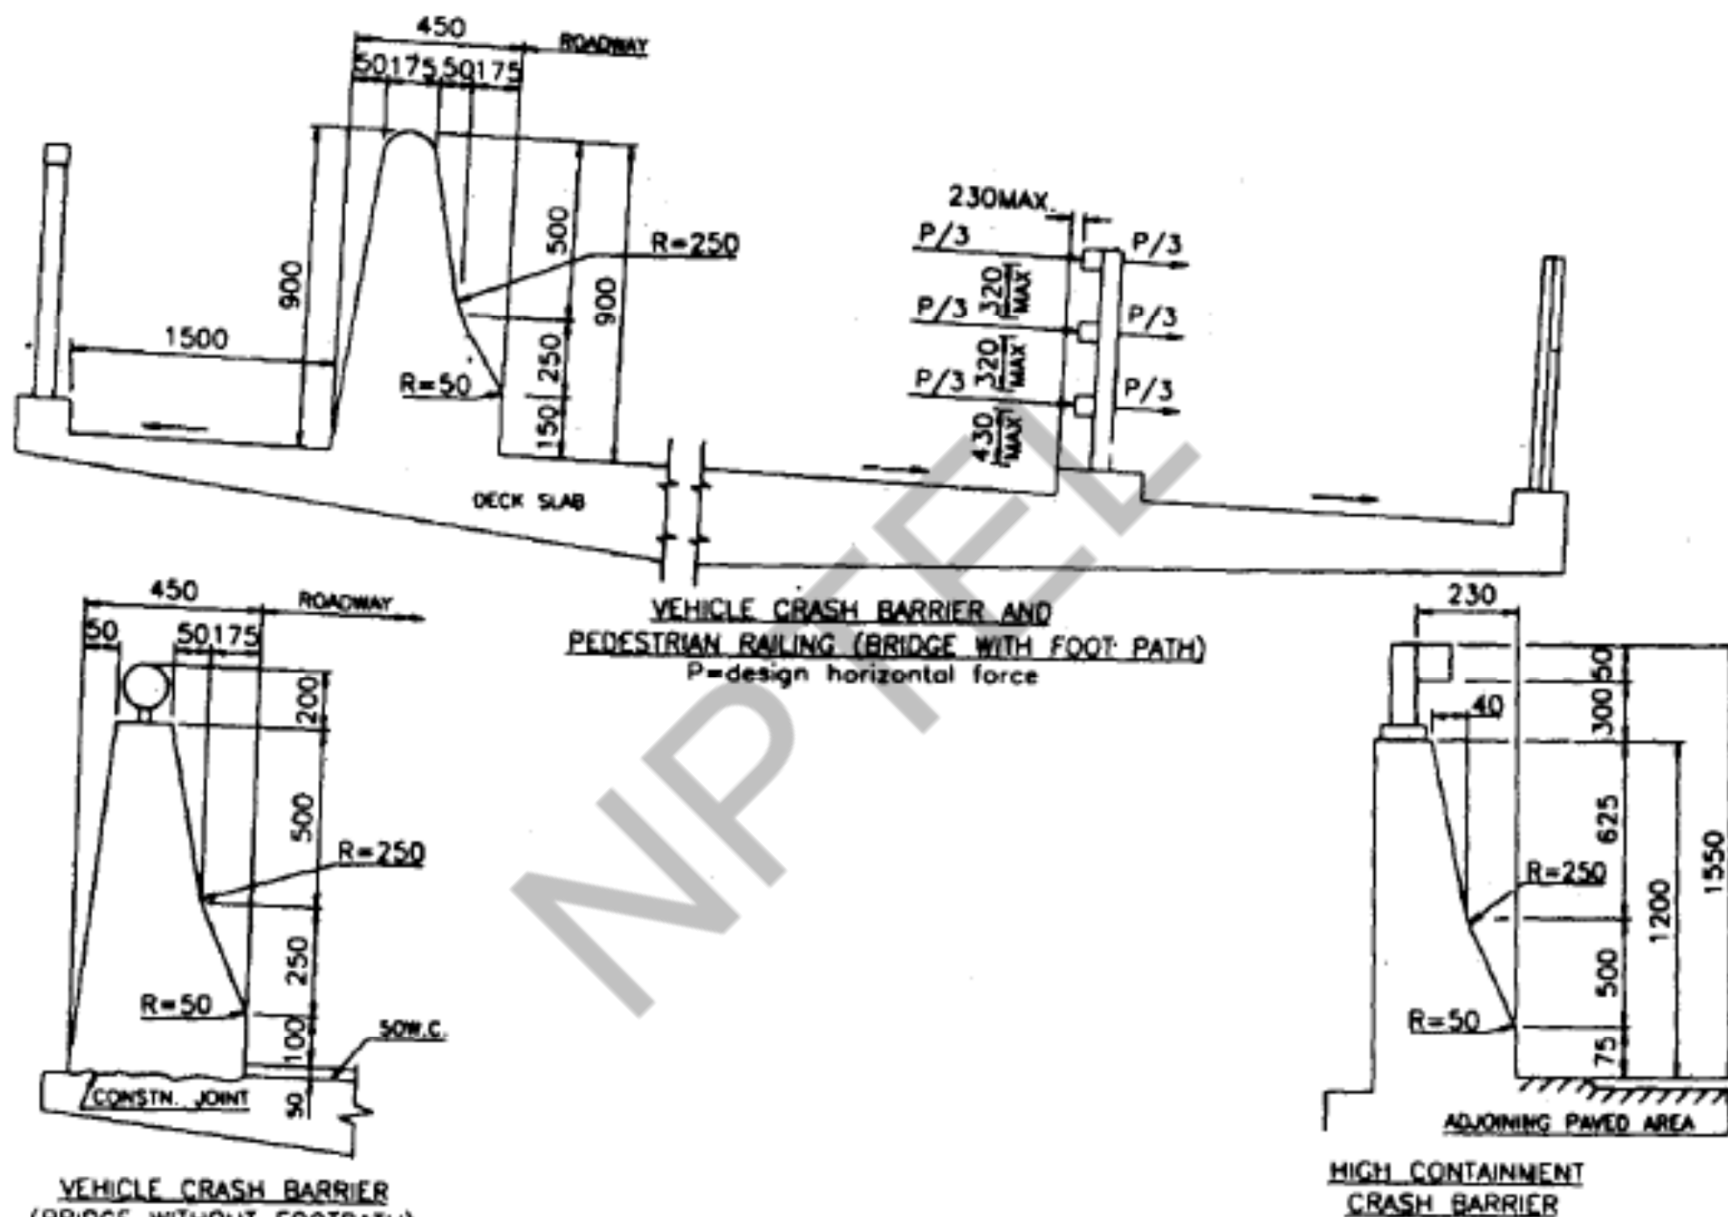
(a). Typical Sketches of Crash Barriers (Clause 115.4.3)
